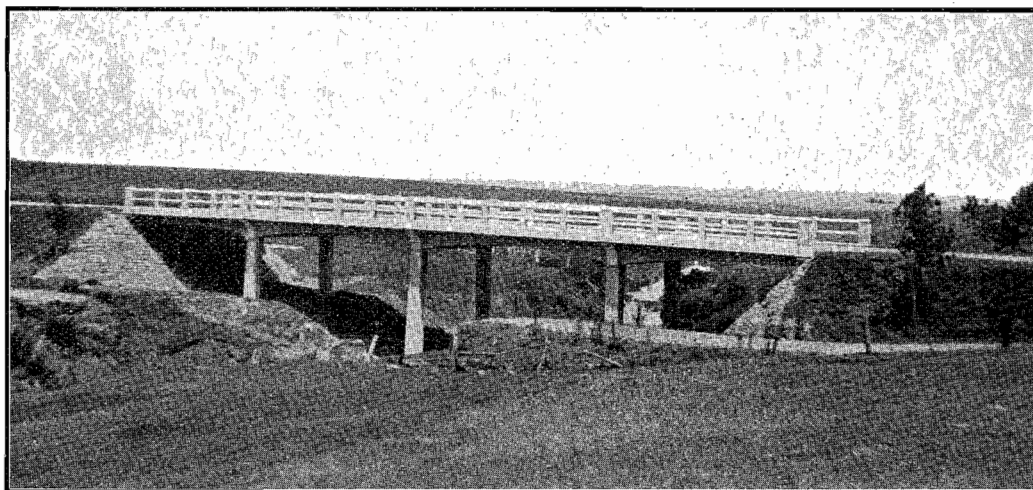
Western Highway. Bridge over Burrumbeet Creek.
